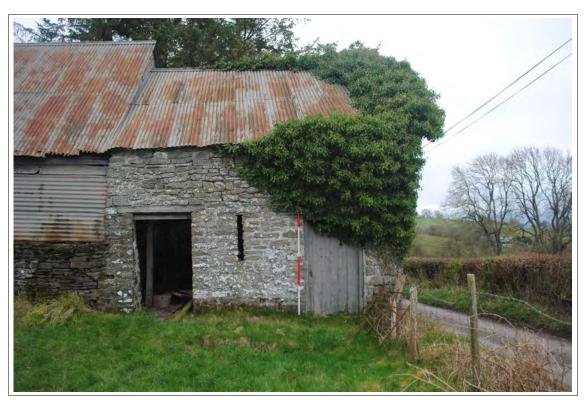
View of two entrances and a ventilation slit on the western elevation for a probable cowhouse or looseboxes (Bays F & G). Looking east-southeast.
